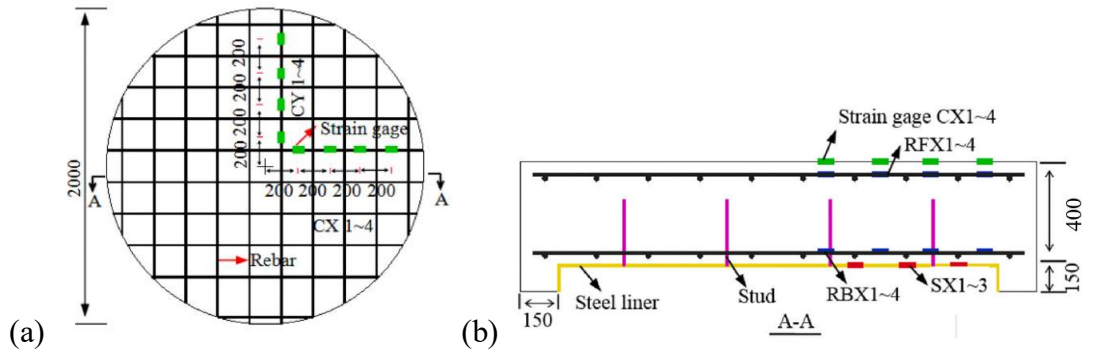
8 Dimension of composite panel. (a) Front view (b) Side view (unit: mm) [246]
